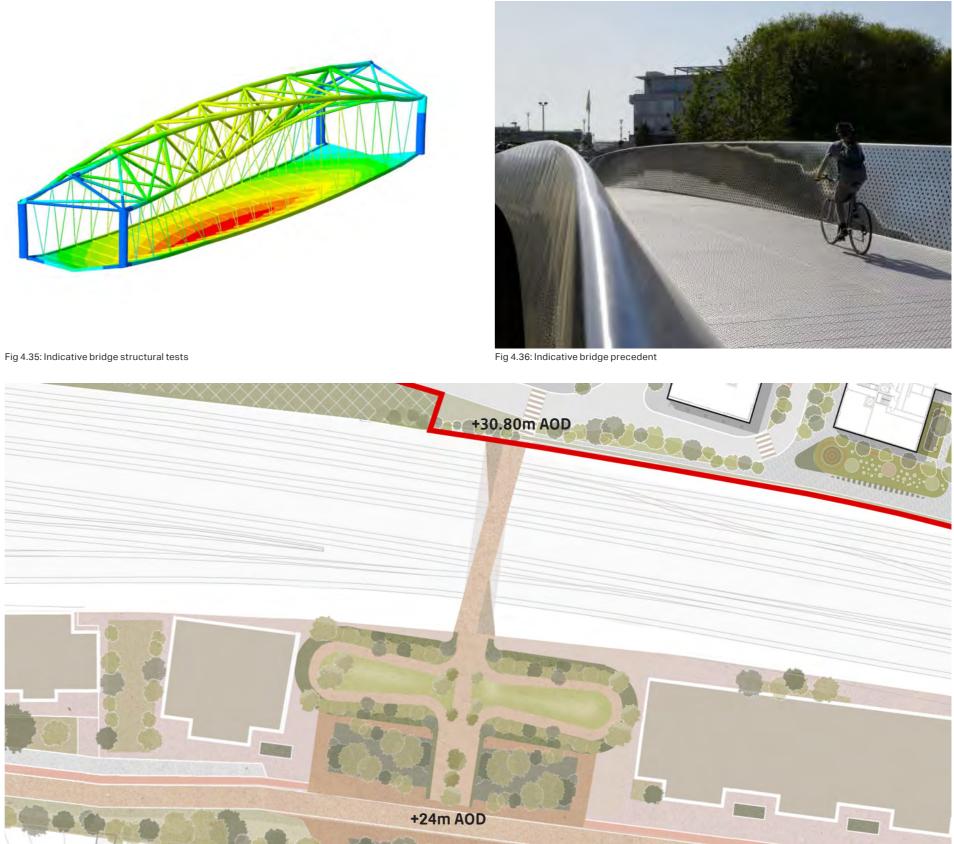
Indicative bridge proposals showing landscape walkway and bridge crossing.
